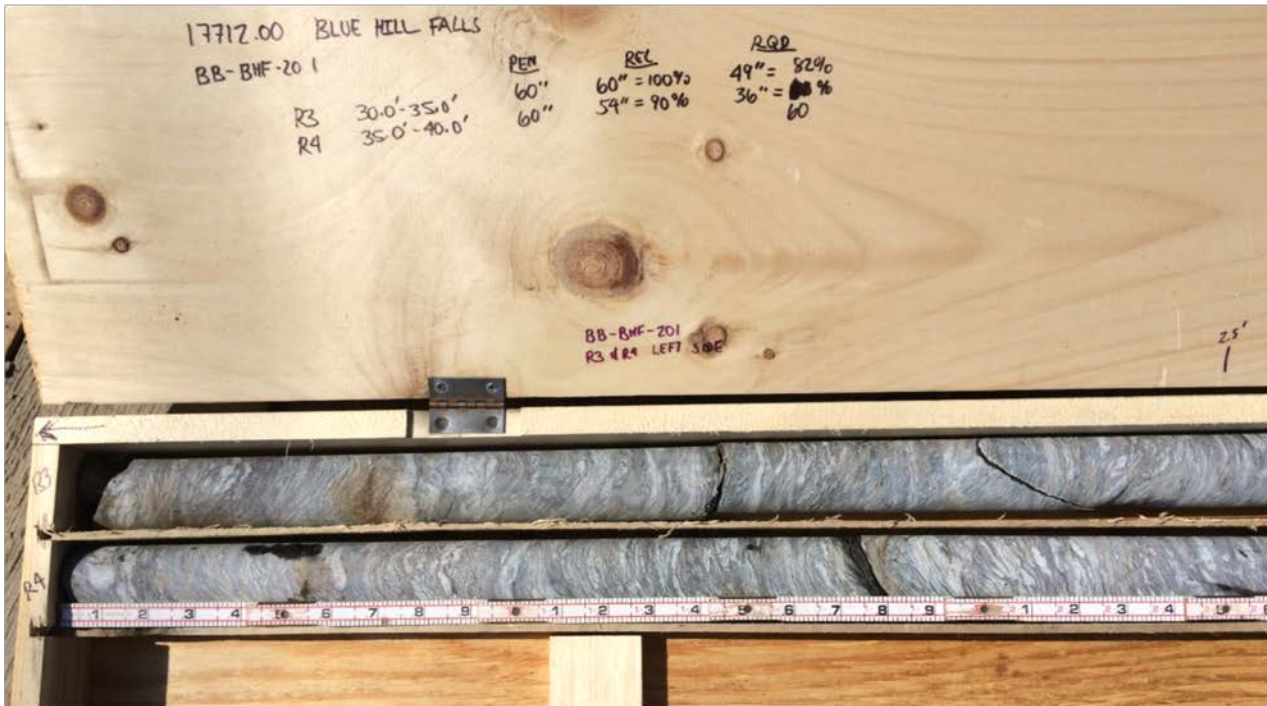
Core box containing dried core from test boring BB-BHF-201:
